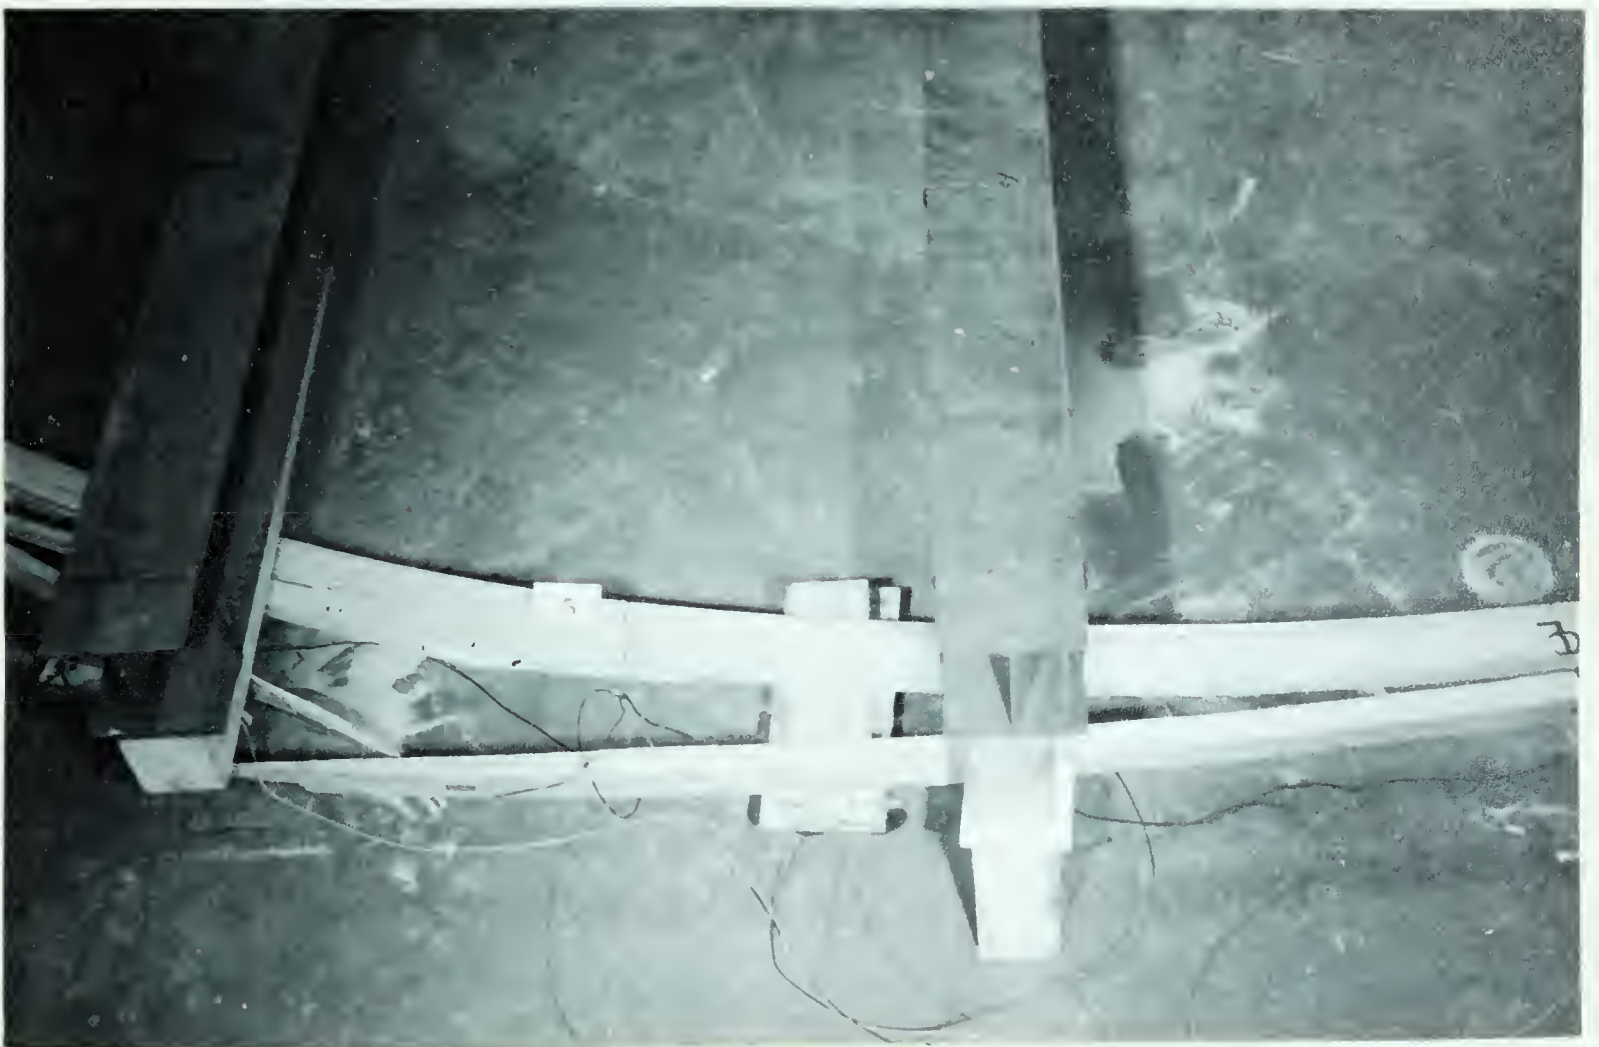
View of Failure in Arch Specimen No. 5.
